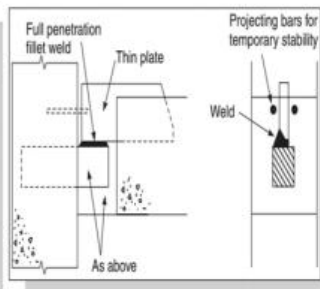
Welded plate beam-to-column hidden connection.
